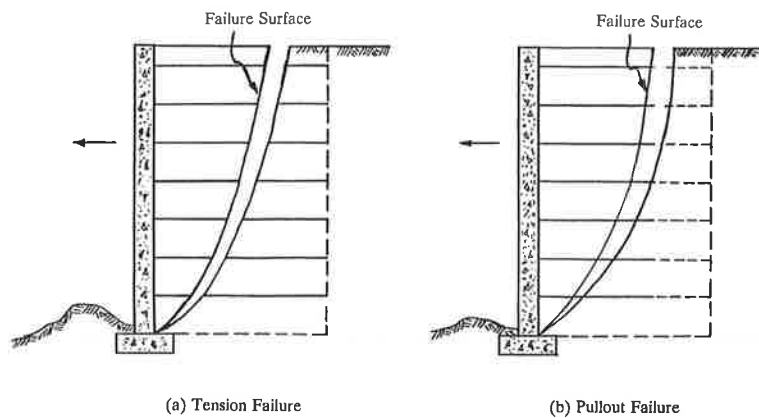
Mechanisms of internal failure in reinforced soil walls.
